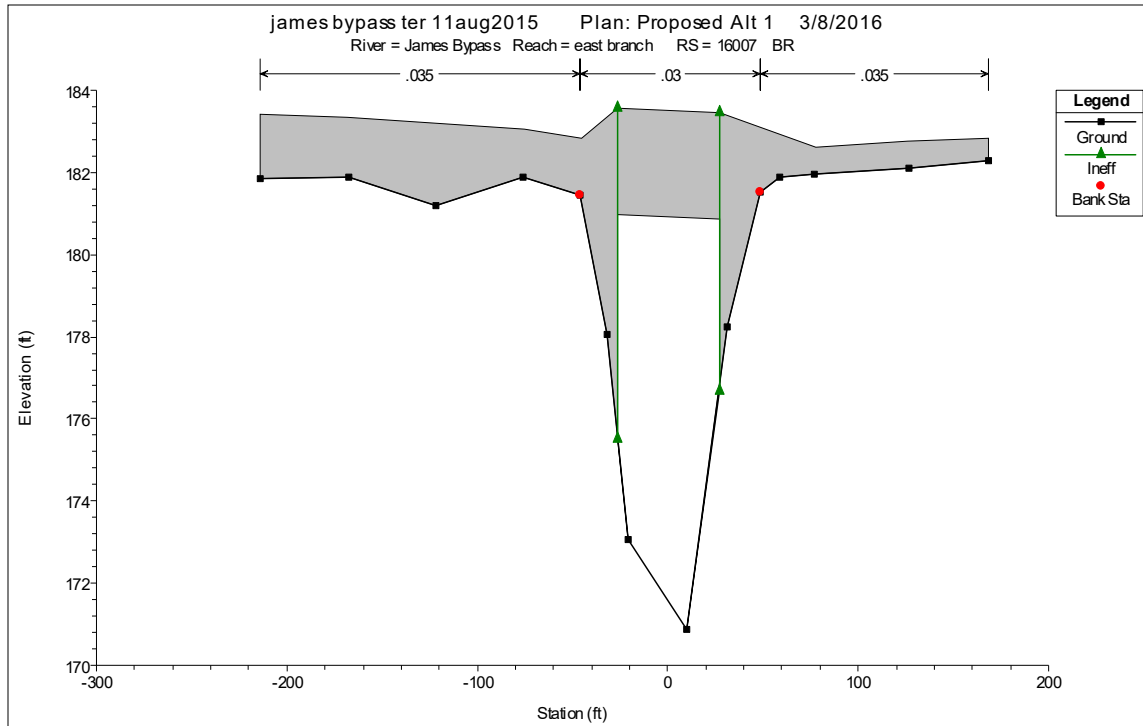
Profile of proposed bridge – East Branch (42C0067)
